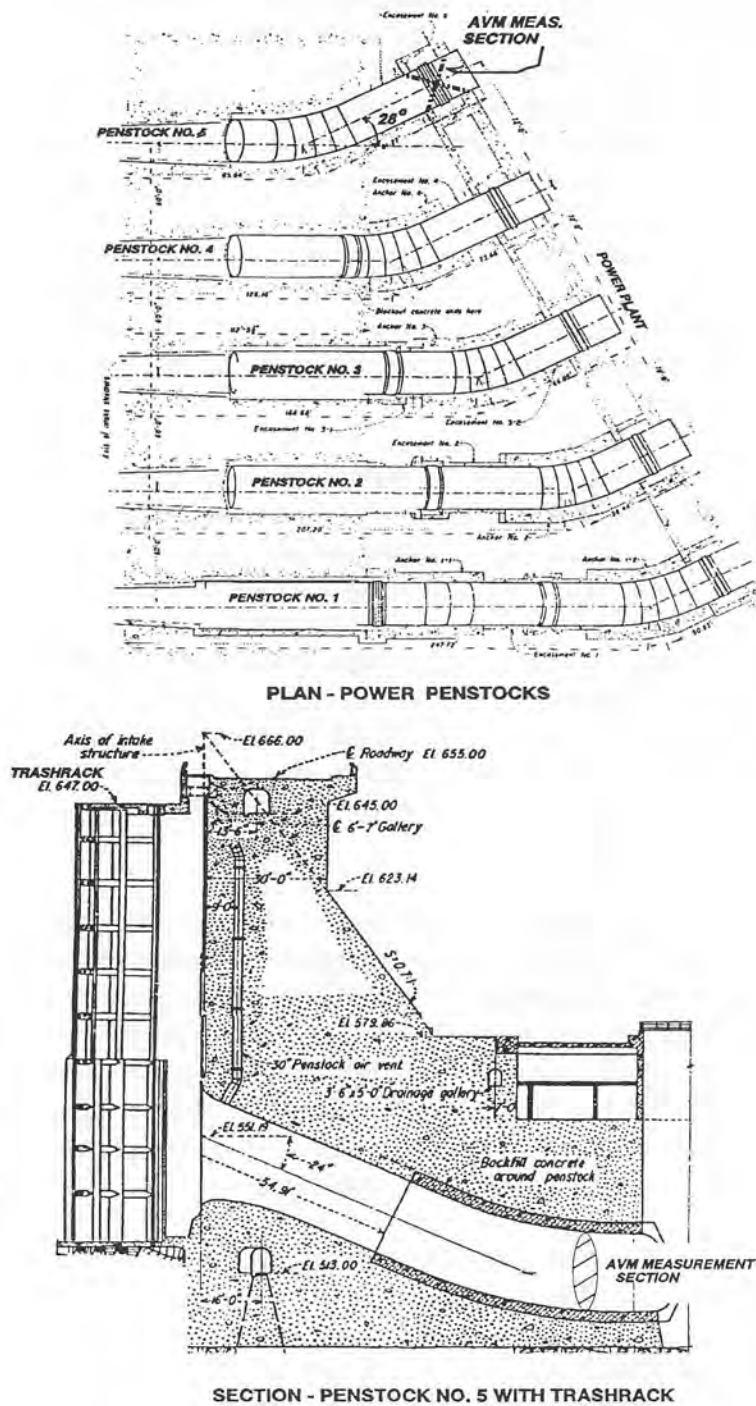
Plan and section of penstock No. 5 at Davis Dam. The AVM measurement section is shown at the end of the penstock. The combined bend has a 24° vertical and a 28° horizontal angle.
